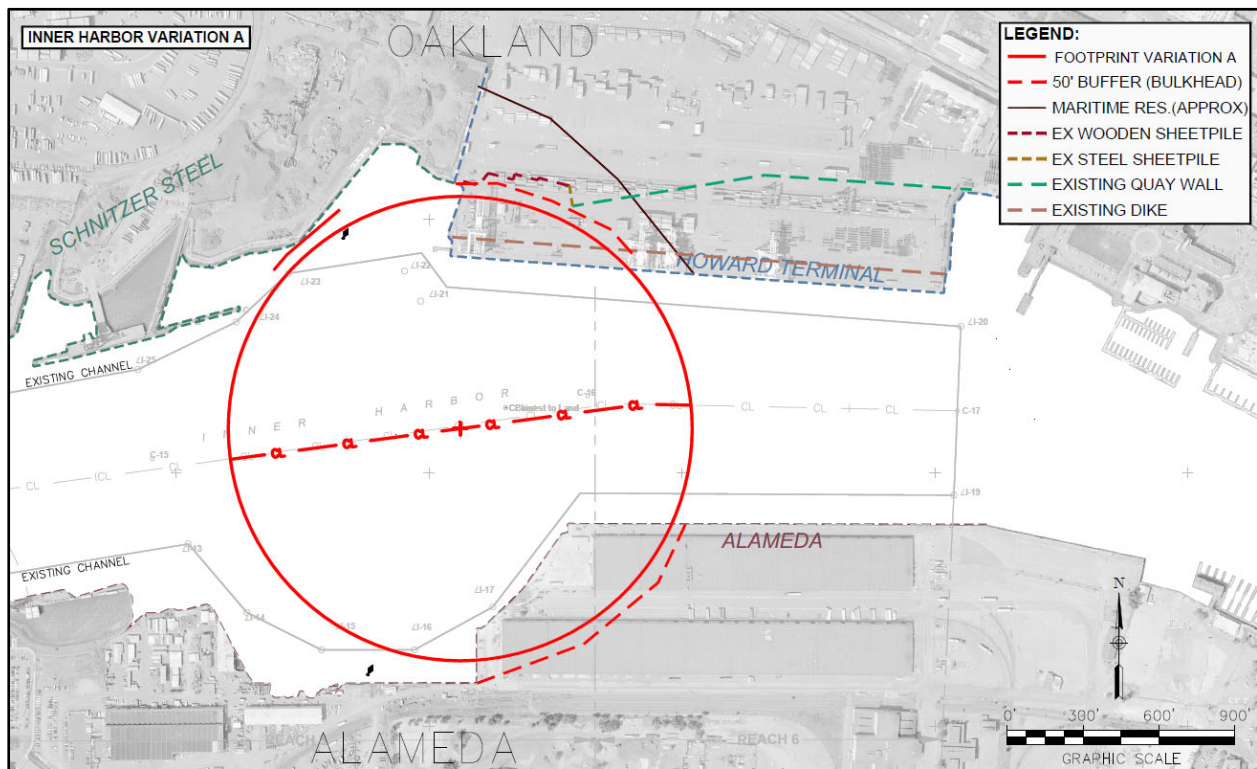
Inner Harbor Turning Basin Proposed Footprint
